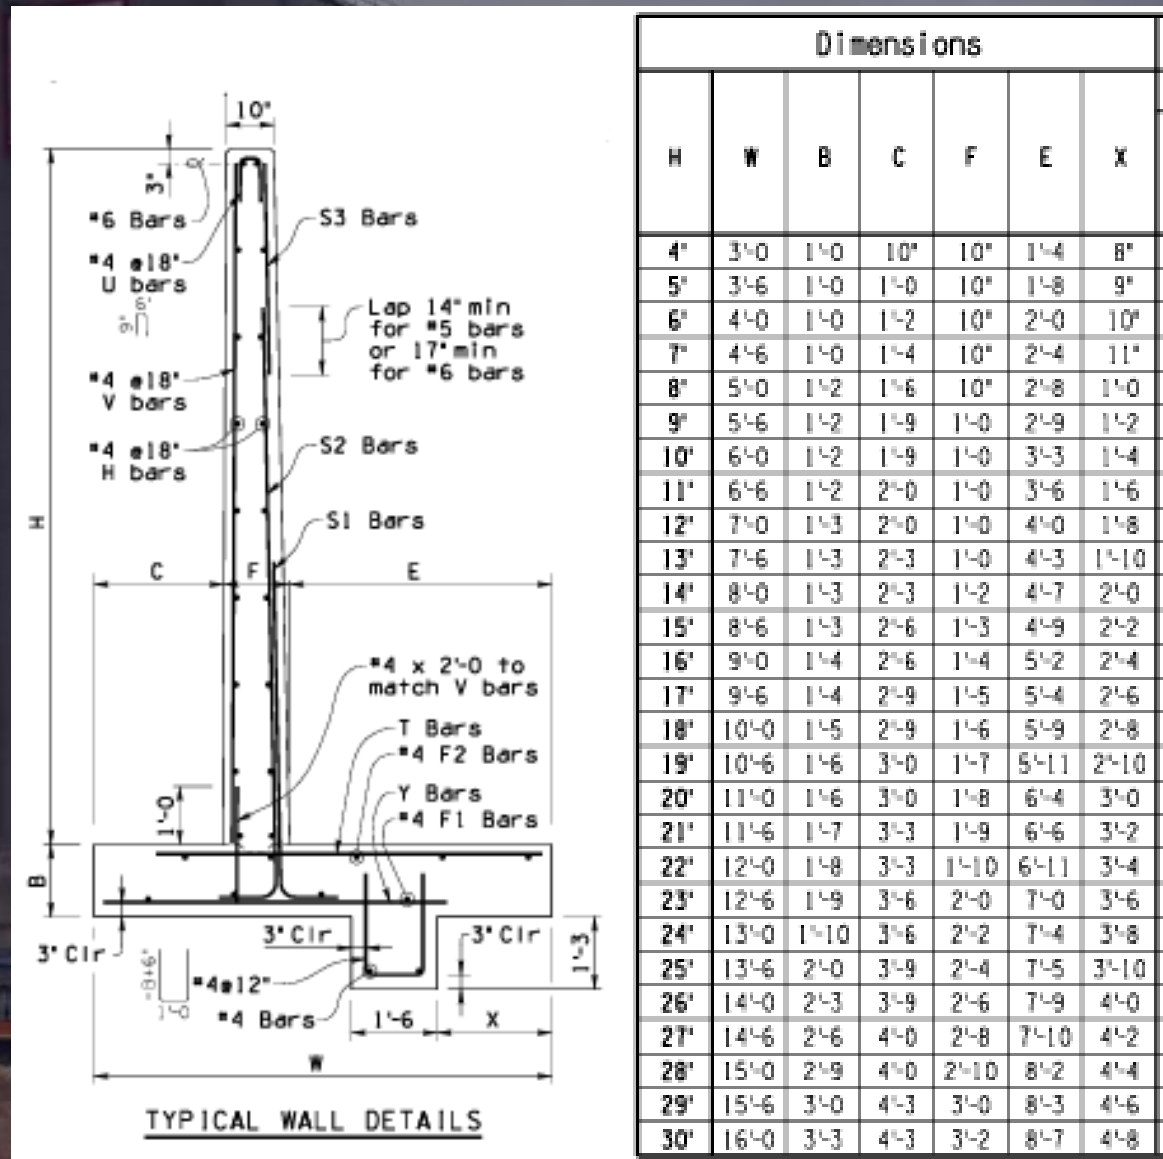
ADOT Typical Retaining Wall with Varying Dimensions [1]
